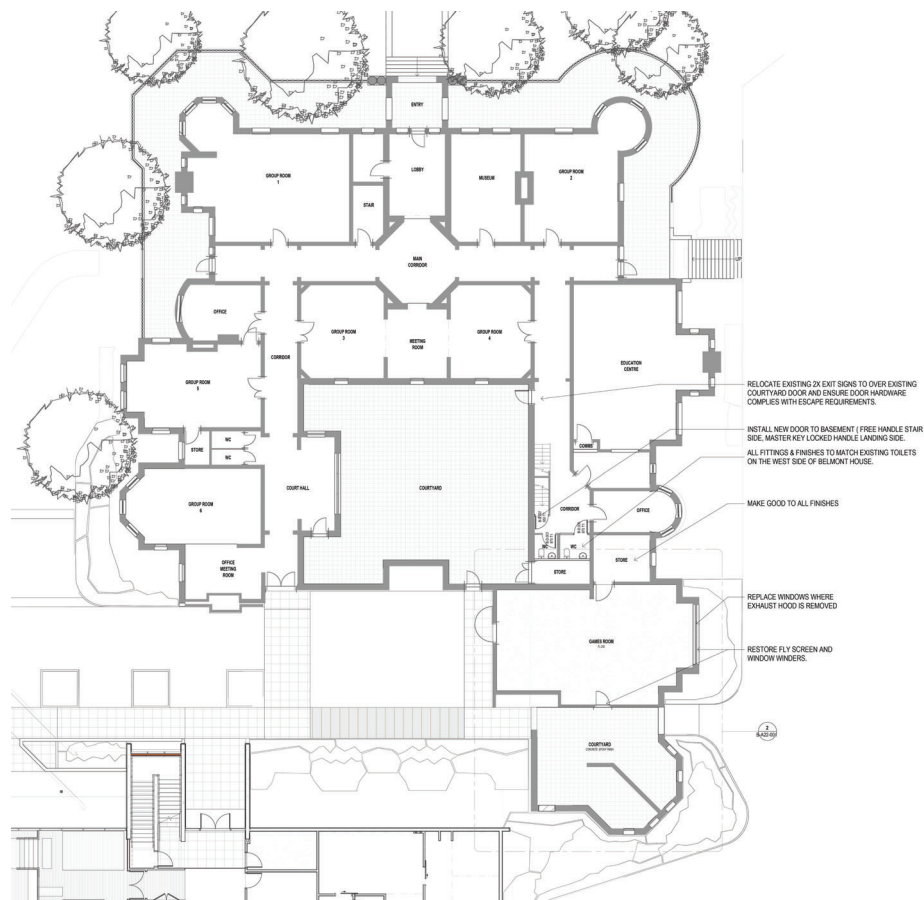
St John of God Richmond Hospital. Proposed Ground Floor Plan for SSD. STH October 2021.
